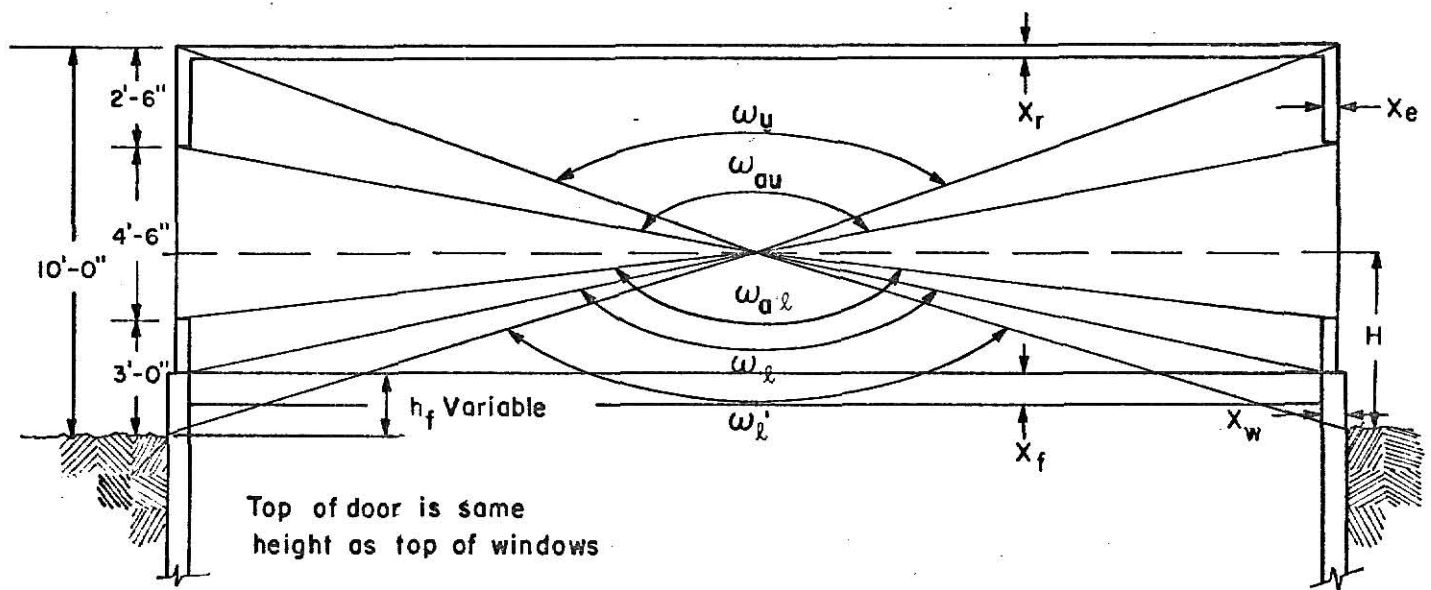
Elevation of the test house with solid angle fractions for a first-story detector location.
